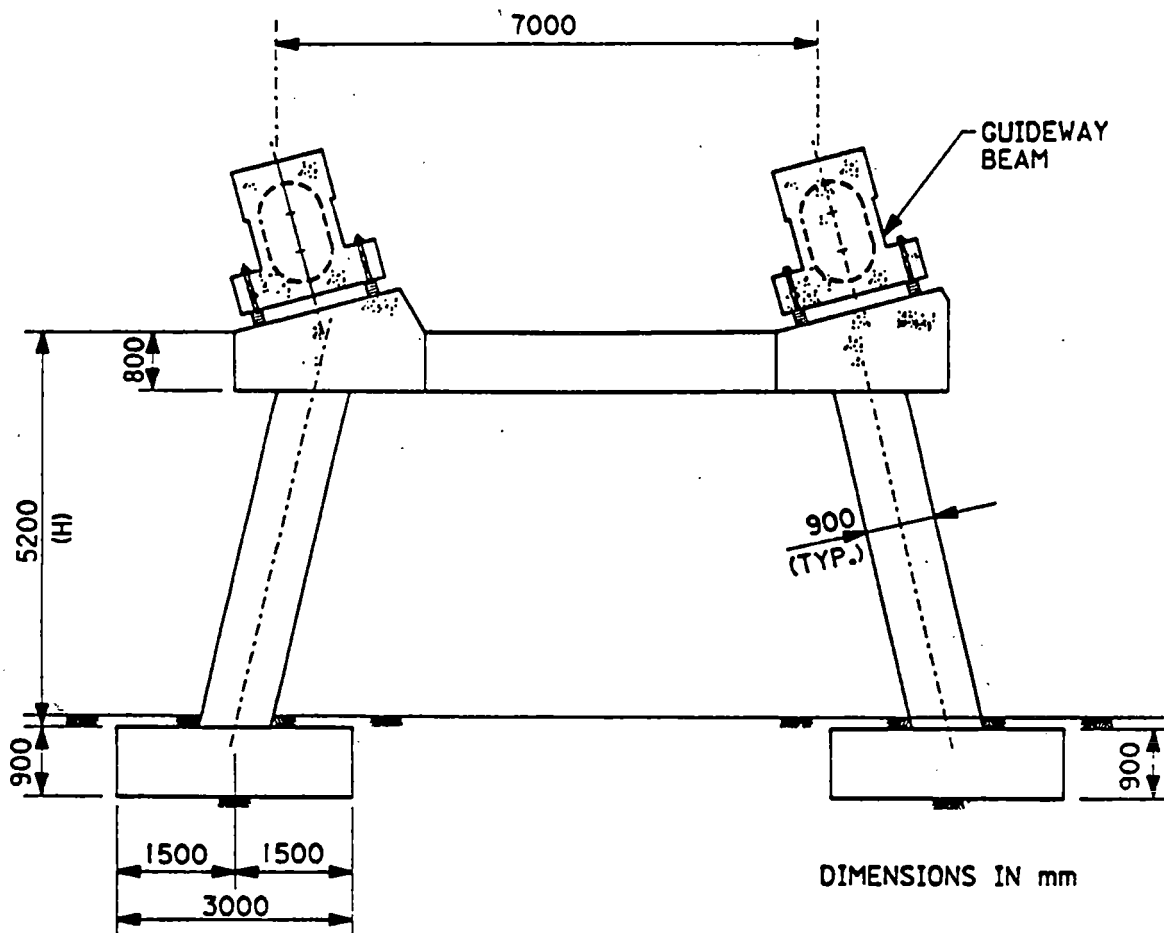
Frame elevation for dual curved track guideway with 25 m span
